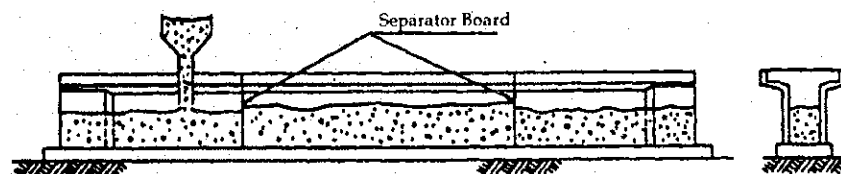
Concrete Placing for the Segment of PC Composite I beam
